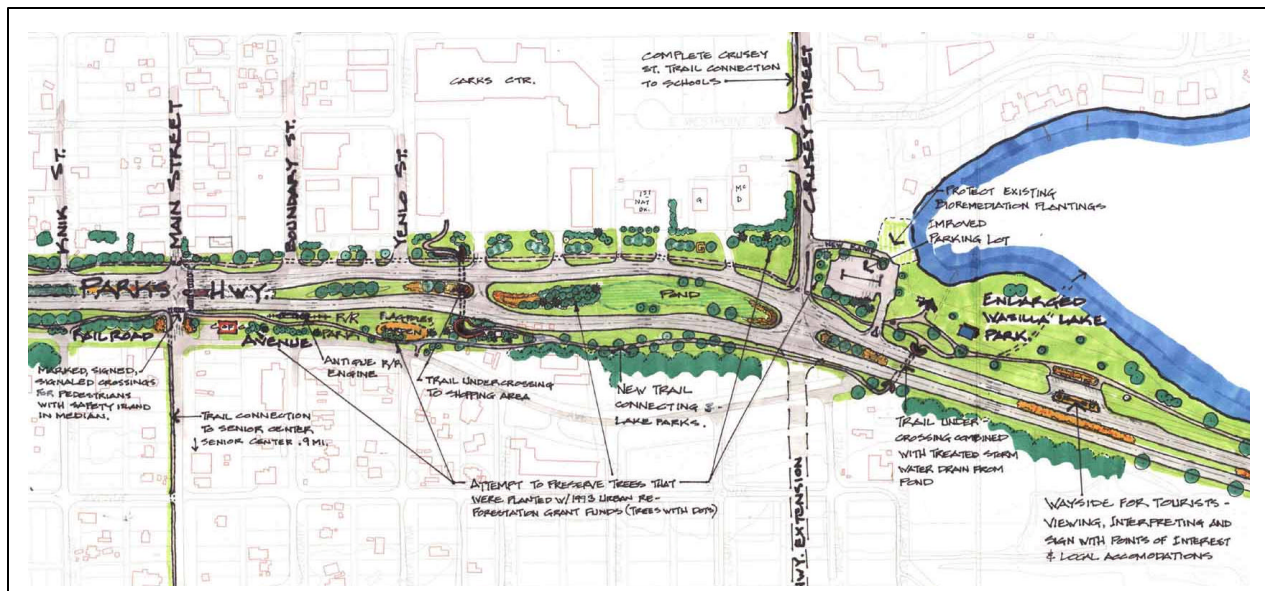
EXCERPT FROM PARKS HIGHWAY LANDSCAPING PLAN
